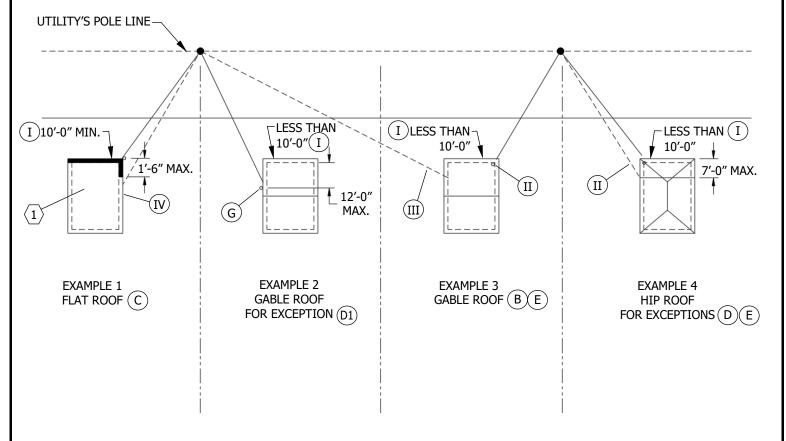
RESIDENTIAL BUILDINGS OR STRUCTURES PLAN VIEW SEE TABLE 1
